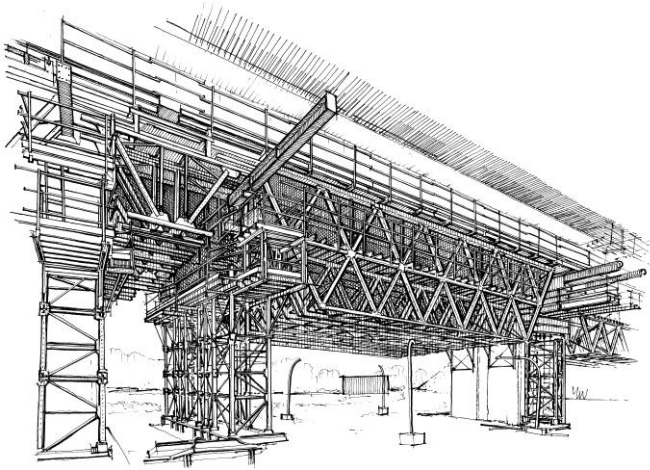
16th July 2018. Installation of the gantry formwork for the first construction stage of the box girders of the eastern approach spans. The falsework is needed to support the bridge deck whilst the concrete is poured, once it has gained enough strength the falsework can be removed and moved on to the next section.
